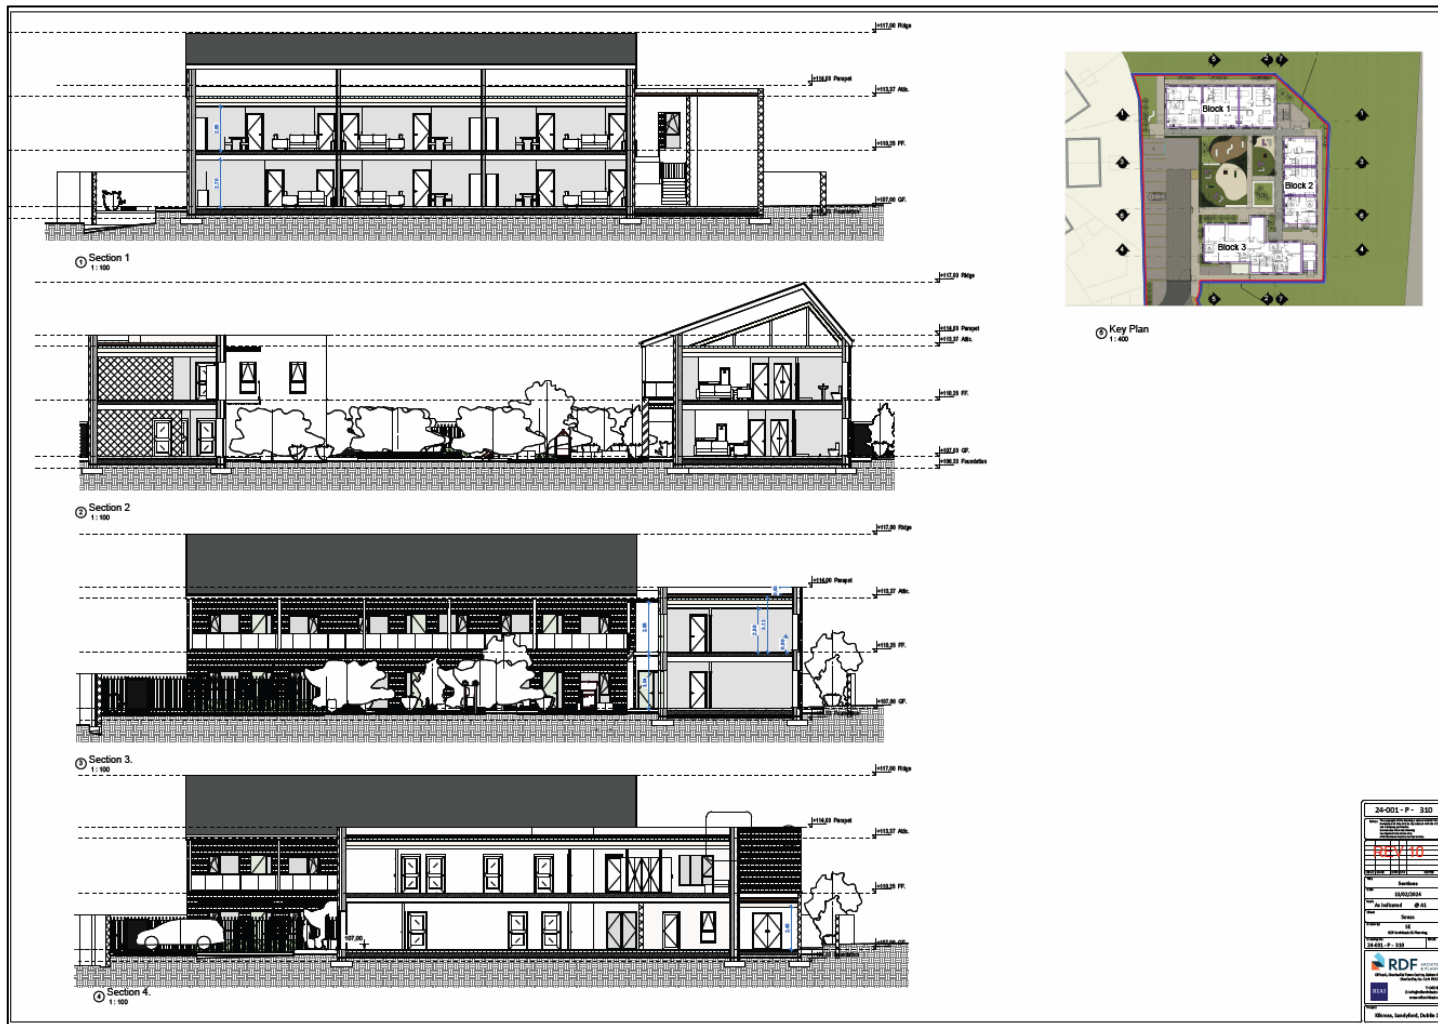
SECTIONS AND ELEVATIONS (RDF ARCHITECTURE DRG No: 24-001-P-310).
